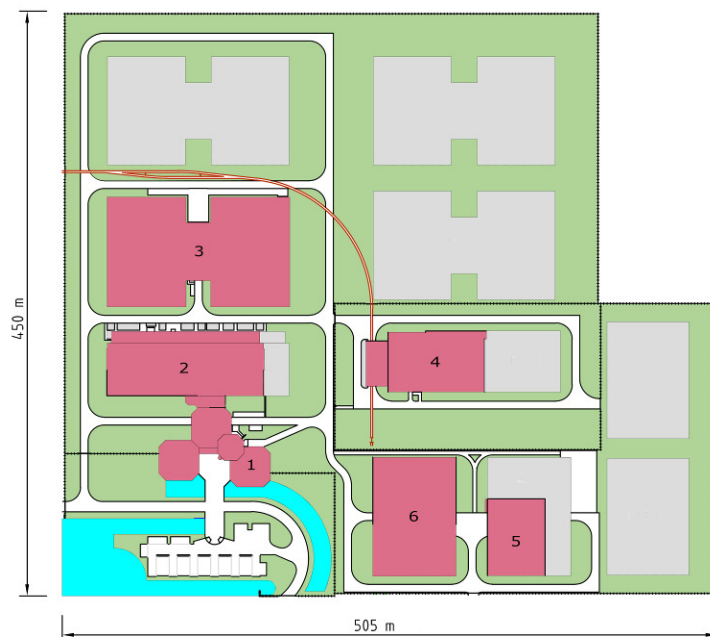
Layout of the COVRA facilities in 2010 (In grey future expansions of the modular buildings are indicated)
